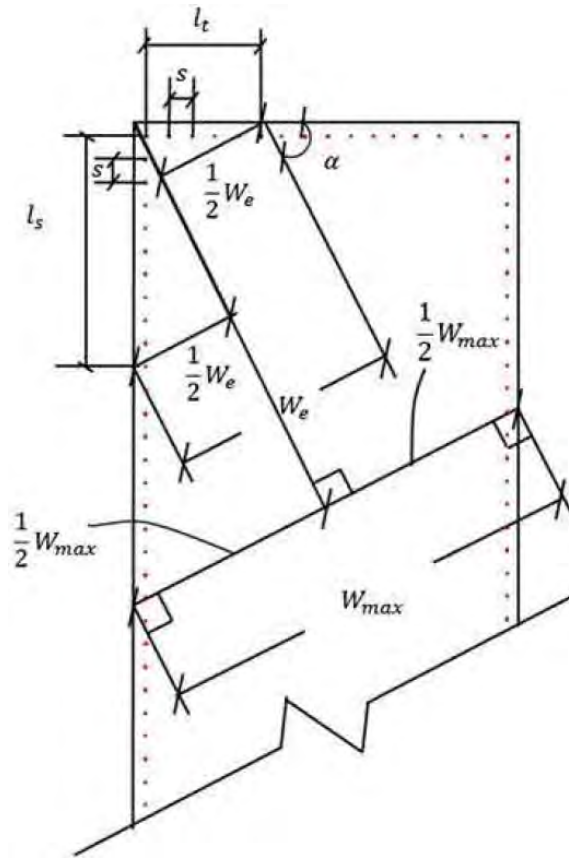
Sheathing-to-framing fastener connection layout and maximum width of the effective strip by Yanagi and Yu (2014)
